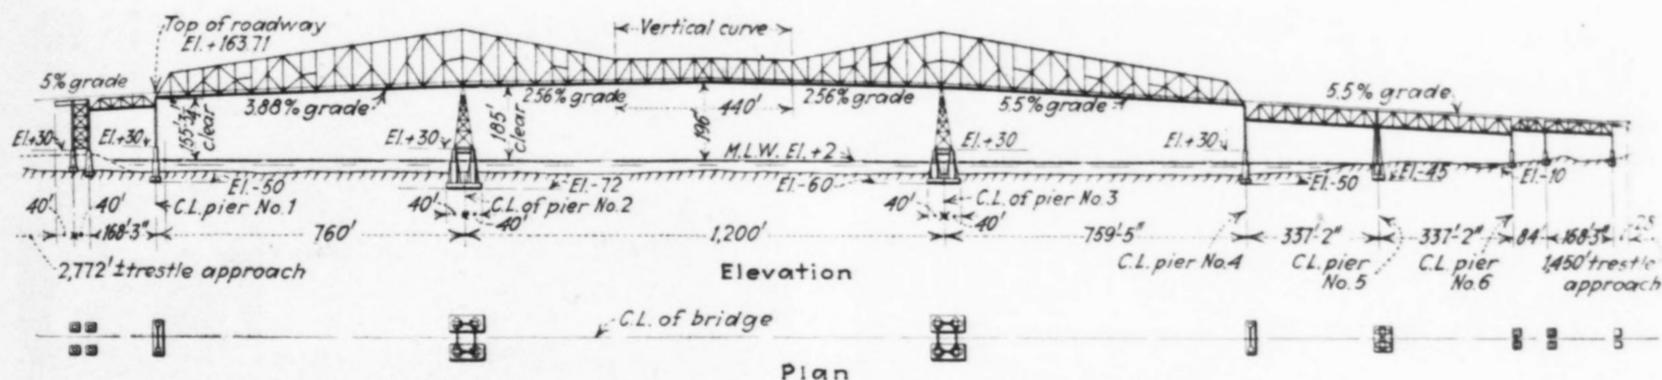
PLAN AND ELEVATION OF COLUMBIA RIVER-LONGVIEW BRIDGE
